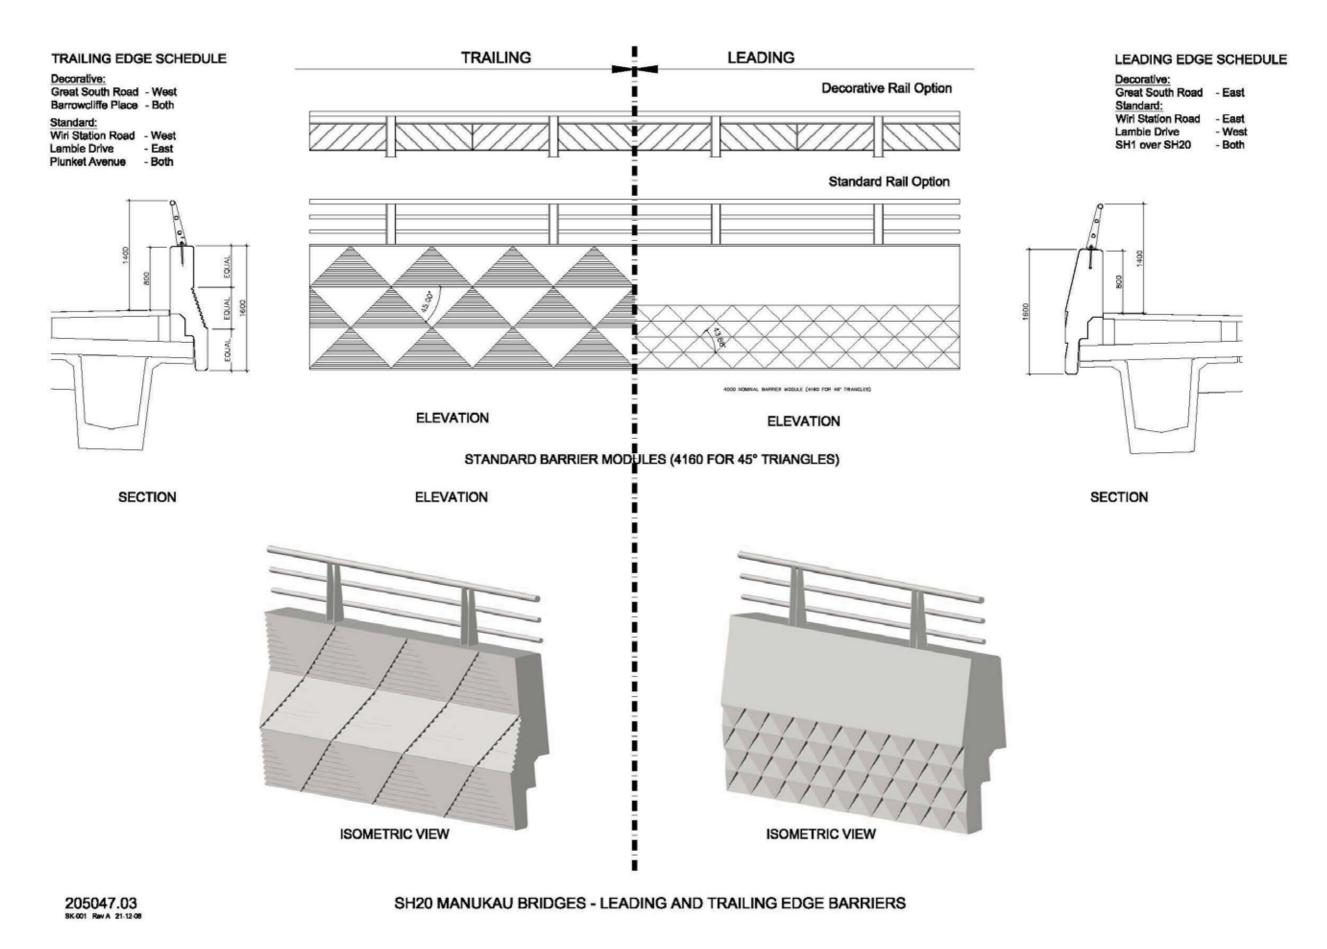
Leading and trailing edge barrier and hand rail set out drawings
